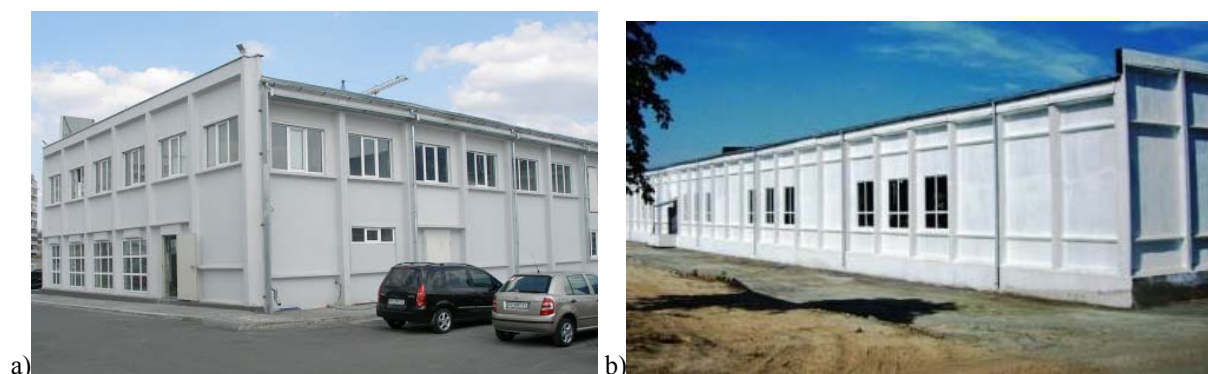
Examples of prefabricated reinforced concrete buildings with a wall structural scheme:
